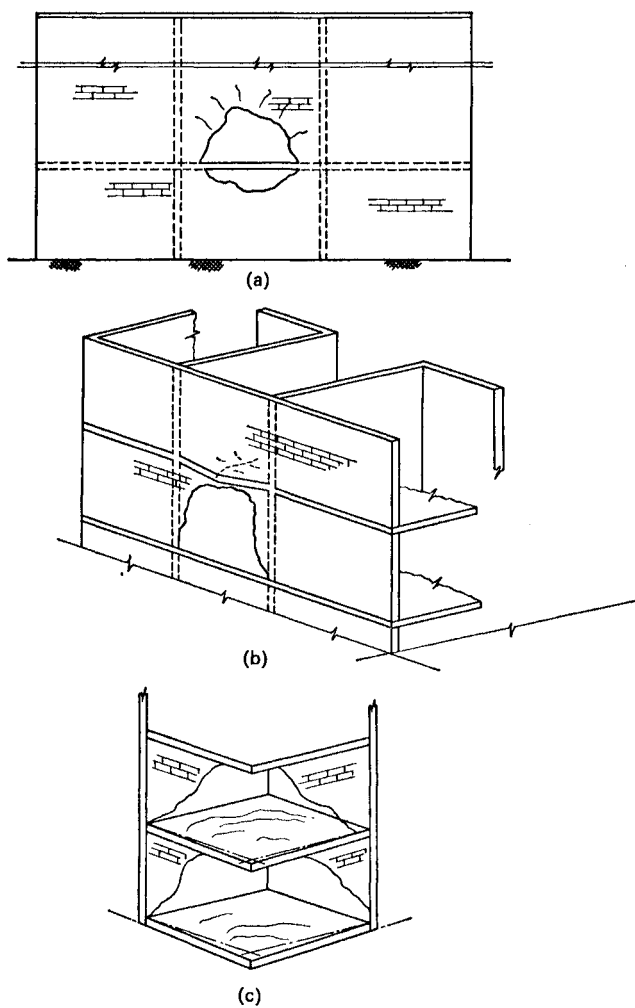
Localized damage due to accidental forces: (a) arching action in brickwork, (b) spanning of floor slab over a damaged section of wall, (c) cantilever action.
